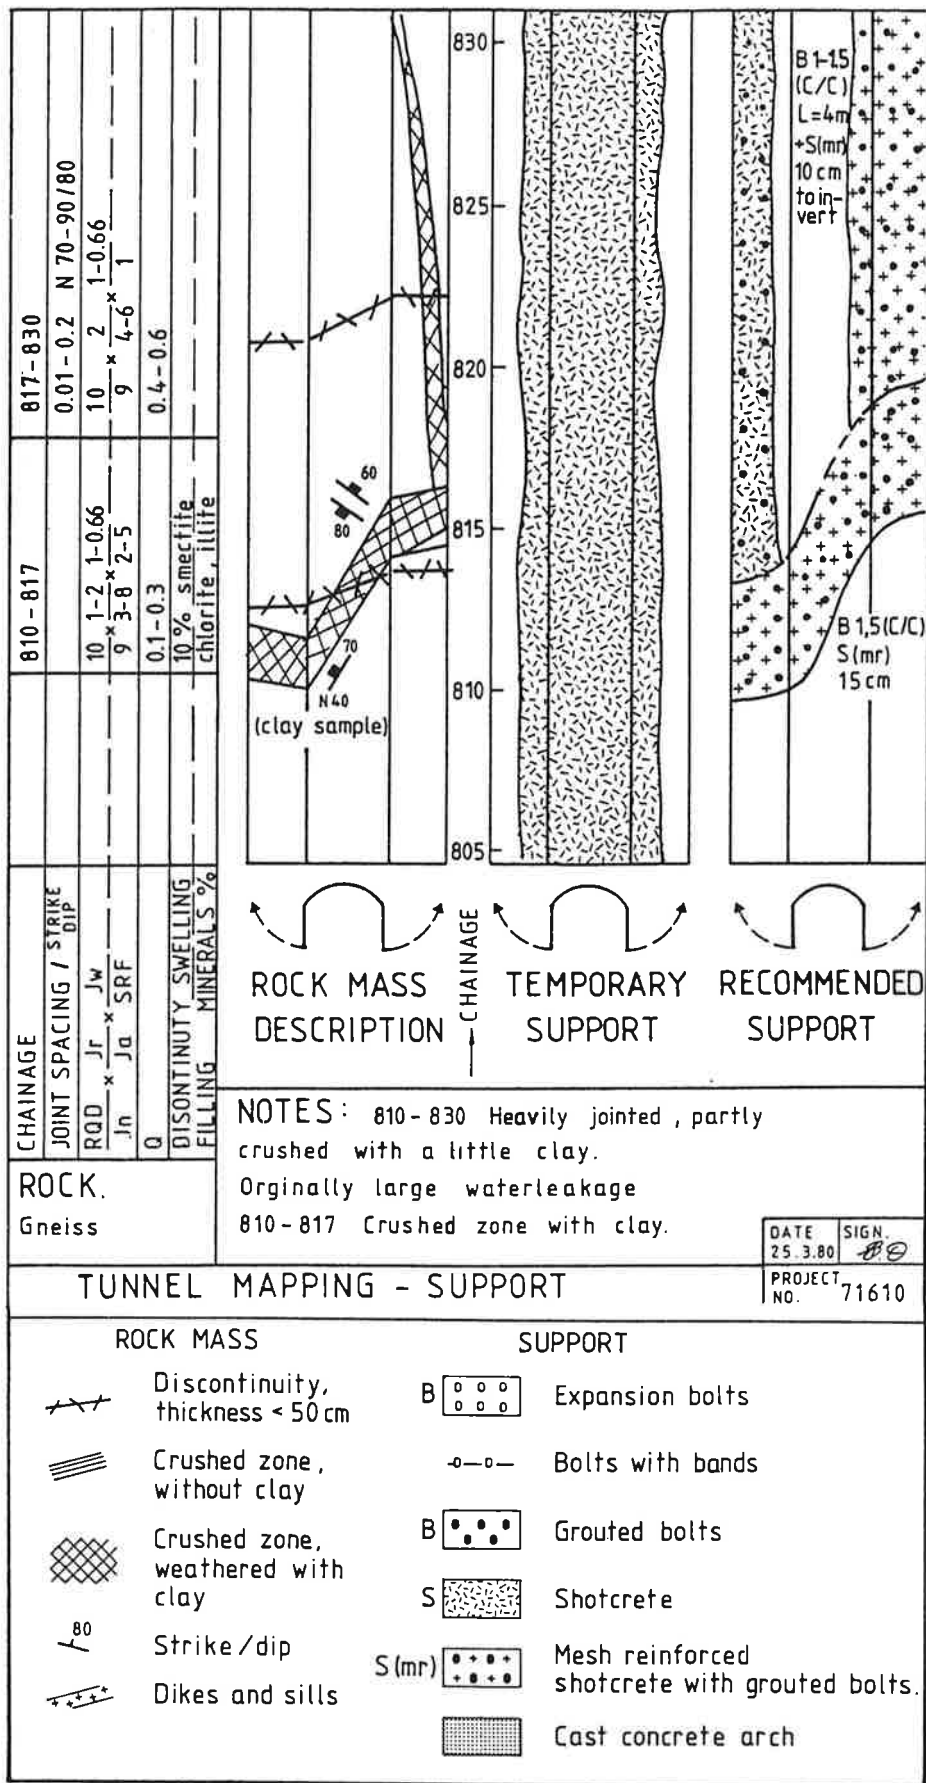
A method of mapping tunnels for Q-system design of the rock reinforcement needs. Headrace tunnel, span 10 m, height 16.7 m (Barton et al., 1980).
